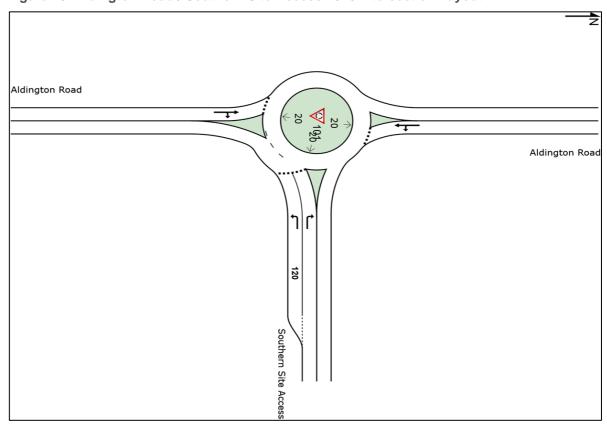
Aldington Road / Southern Site Access 2031 Intersection Layout
